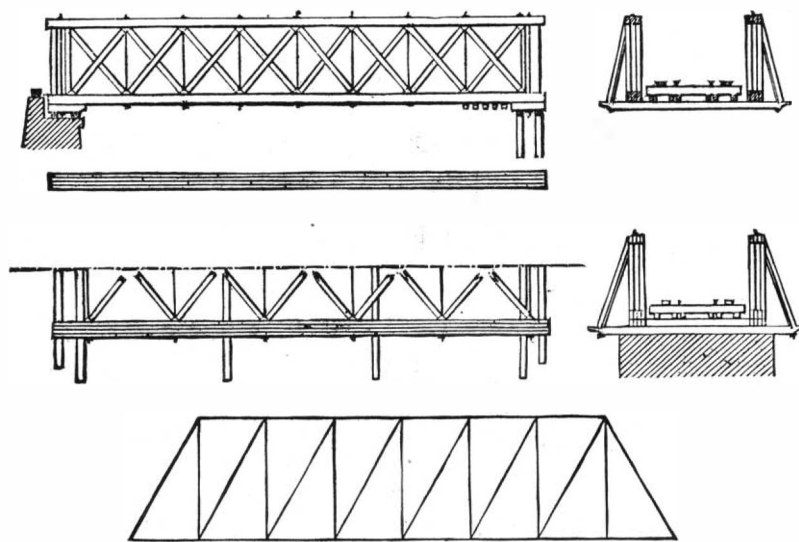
BRIDGE OF 65 FOOT SPAN. (Scale, 1-300.)
